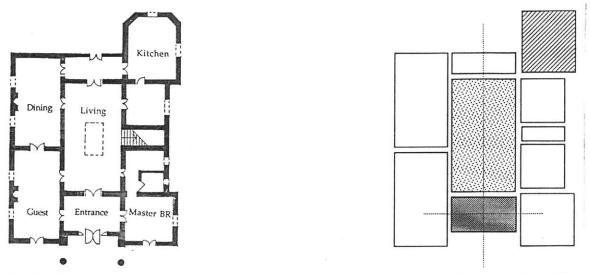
The ground floor plan--Tawfik al-Suwaydi House.
